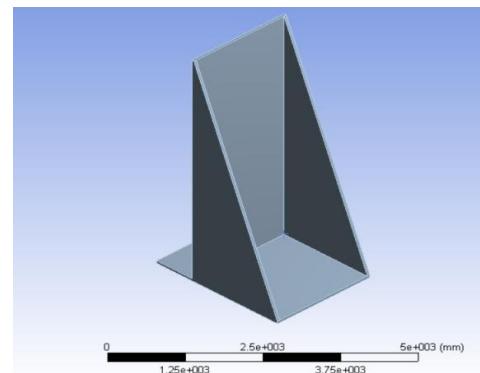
Ferrocement Rectangle Retaining Wall of 50 mm Thick
